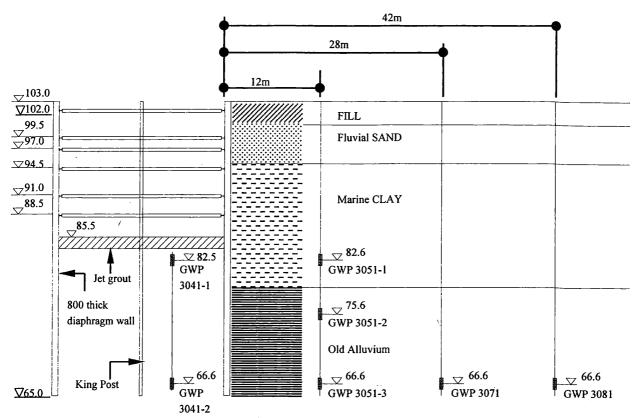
Excavation and instrumentation at cut and cover tunnel at Race Course Road
